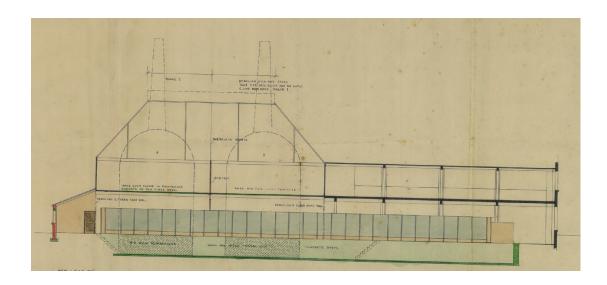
Building G north elevation in the 1950s showing the tunnel kiln and inspection chamber underneath (source: Worcester Porcelain Museum)
